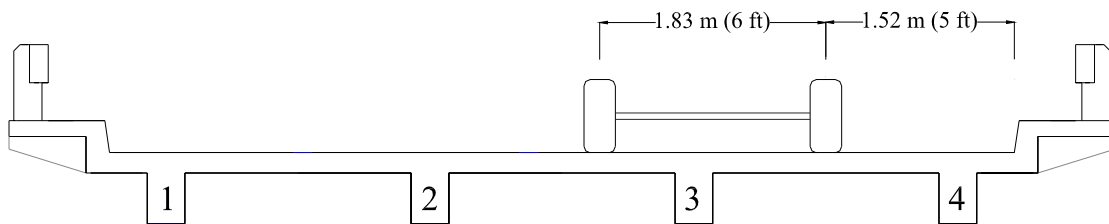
Cross section of the bridge deck and assumed load case in the hand calculations.
